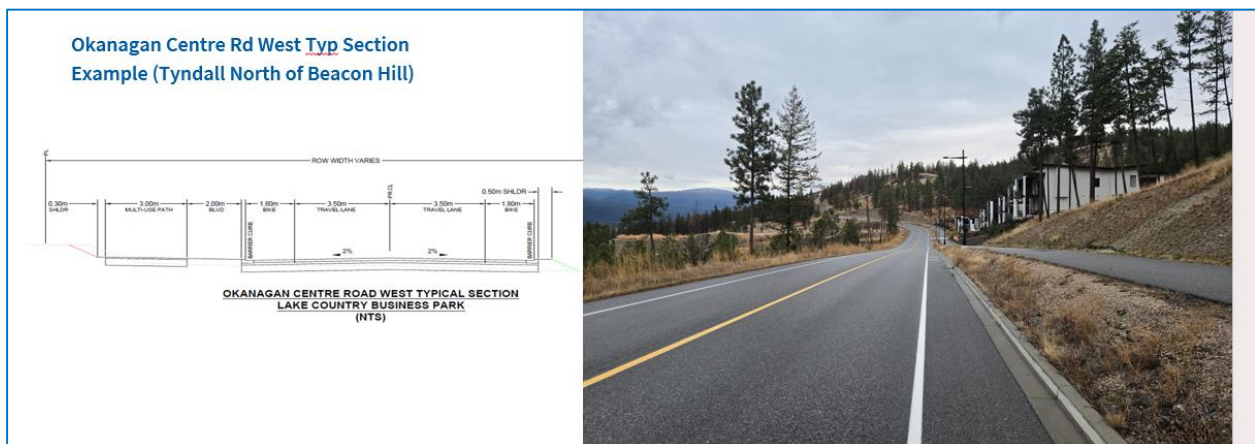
The 2026 PDA – Future OK Centre Rd West road standard
